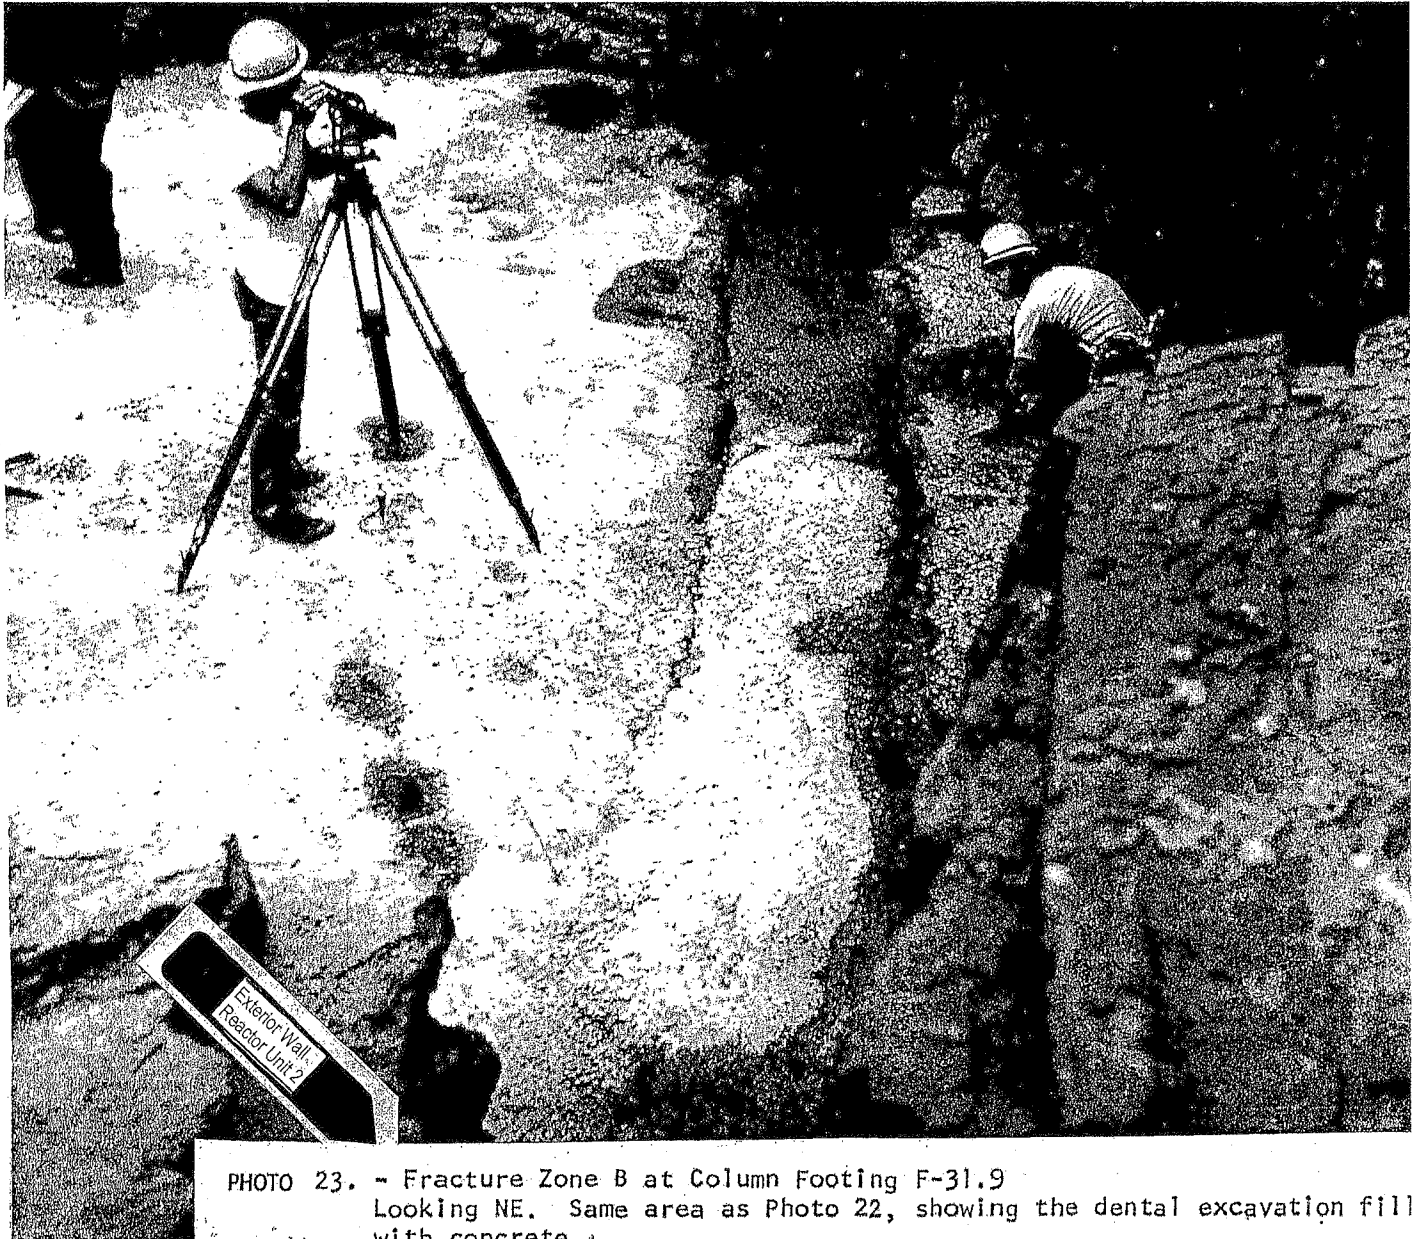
Fracture Zone B at Column Footing F-31.9 Looking NE. Same area as Photo 22, showing the dental excavation fill with concrete.
